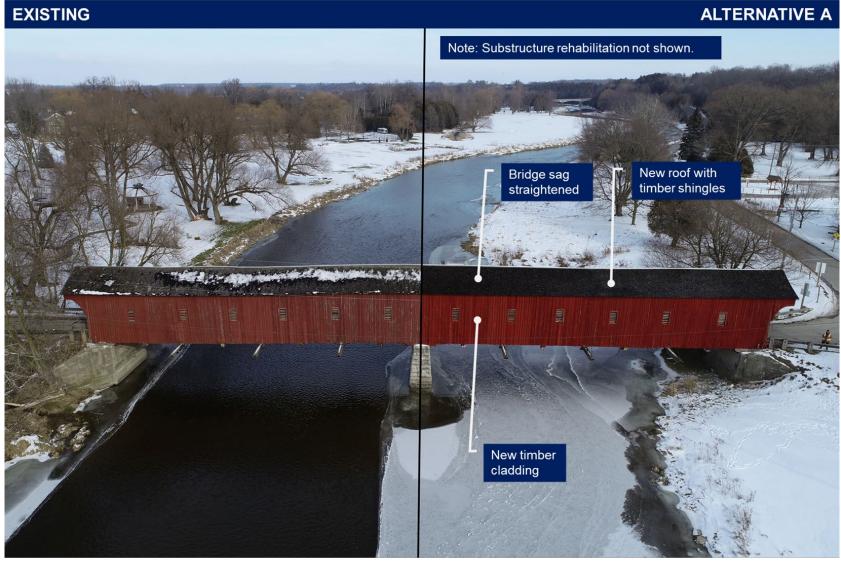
Elevation View – Existing and Alternative A (Steel Girder Reinforcement)
